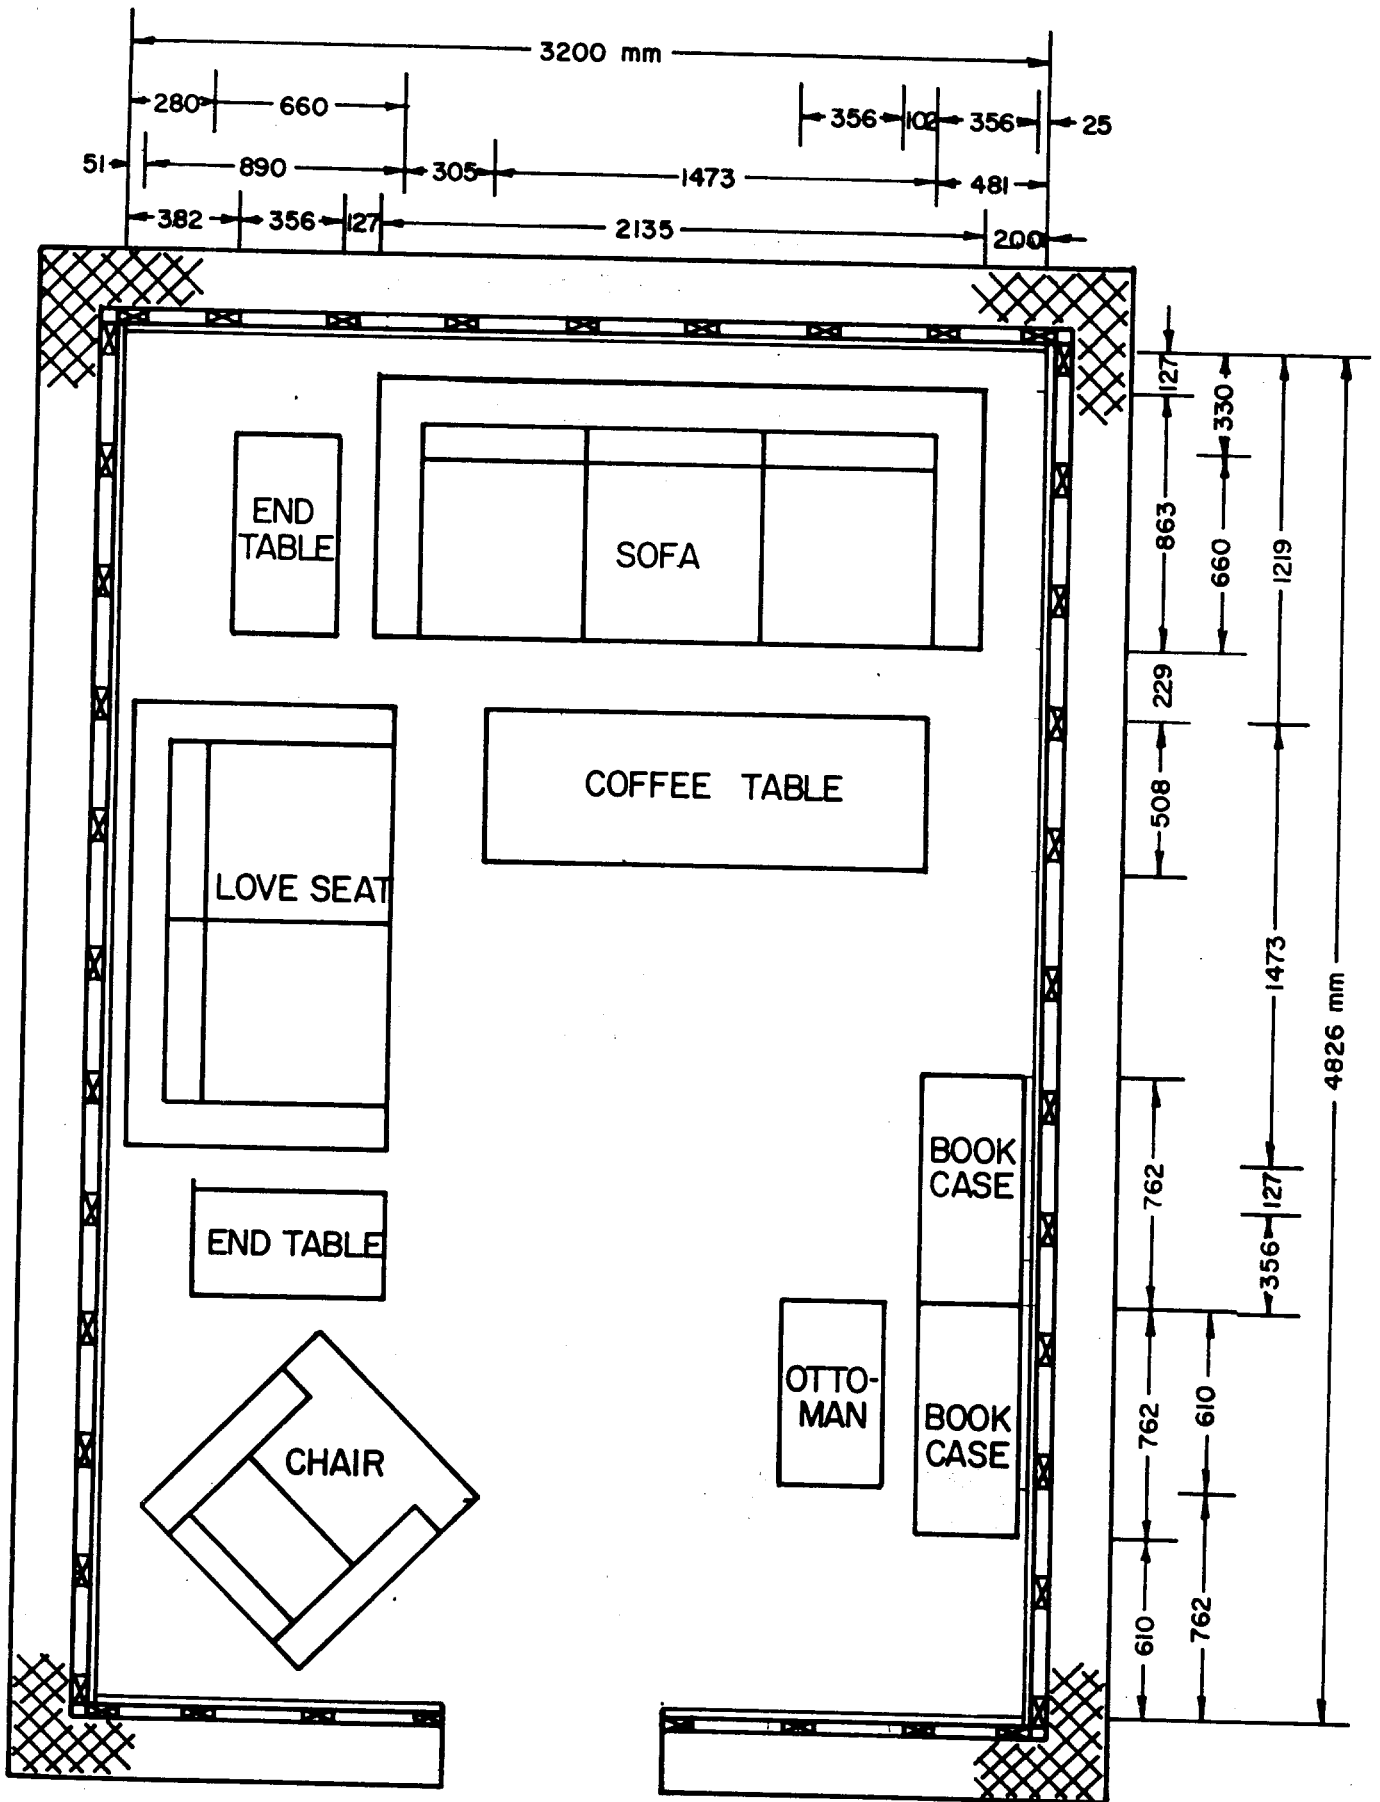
Layout of furniture and wall linings for the 3.3 x 4.9 m test room
